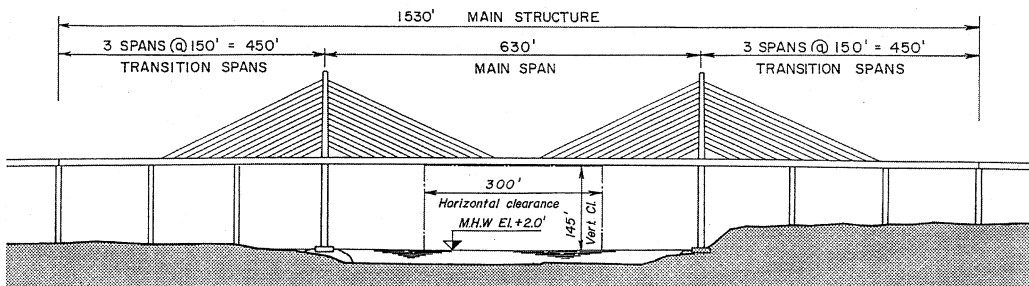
James River Bridge, Massachusetts – elevation.
